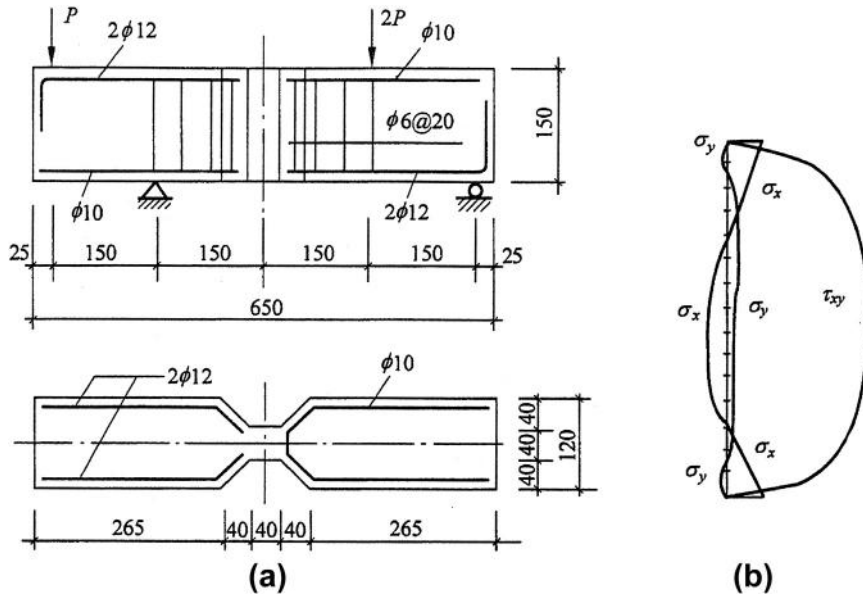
Shear strength test of beam specimen loaded at four points [2-31]: (a) specimen and loading, (b) stress distribution on section
